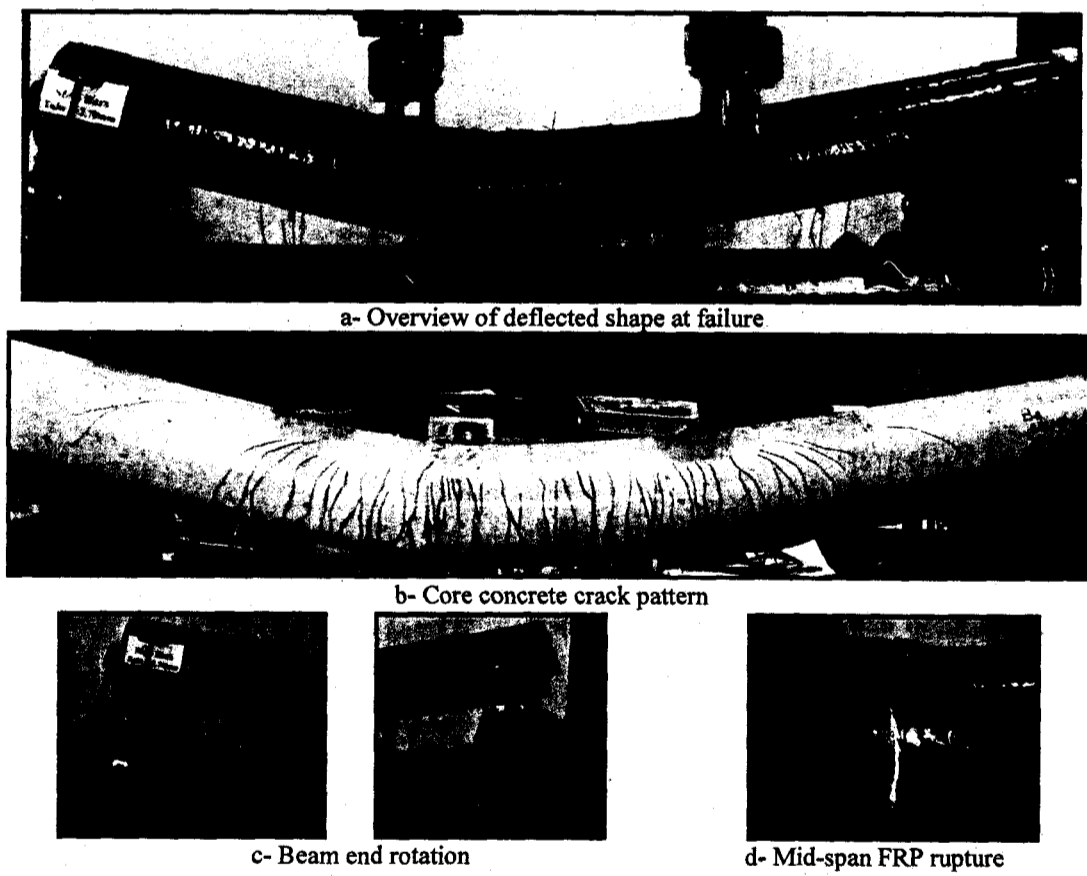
Failure mode and concrete core crack pattern of RCFFT beam D-S-M
